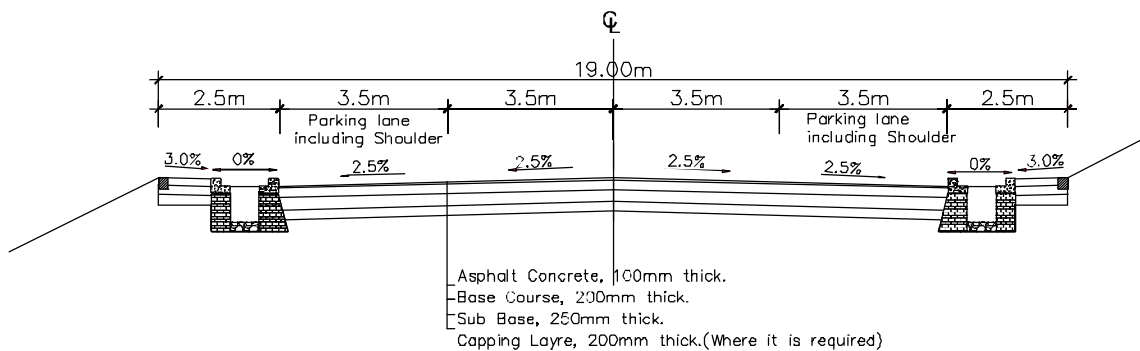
Proposed Typical Cross Section (Wereda Town and Populated Area in D/Markos)
